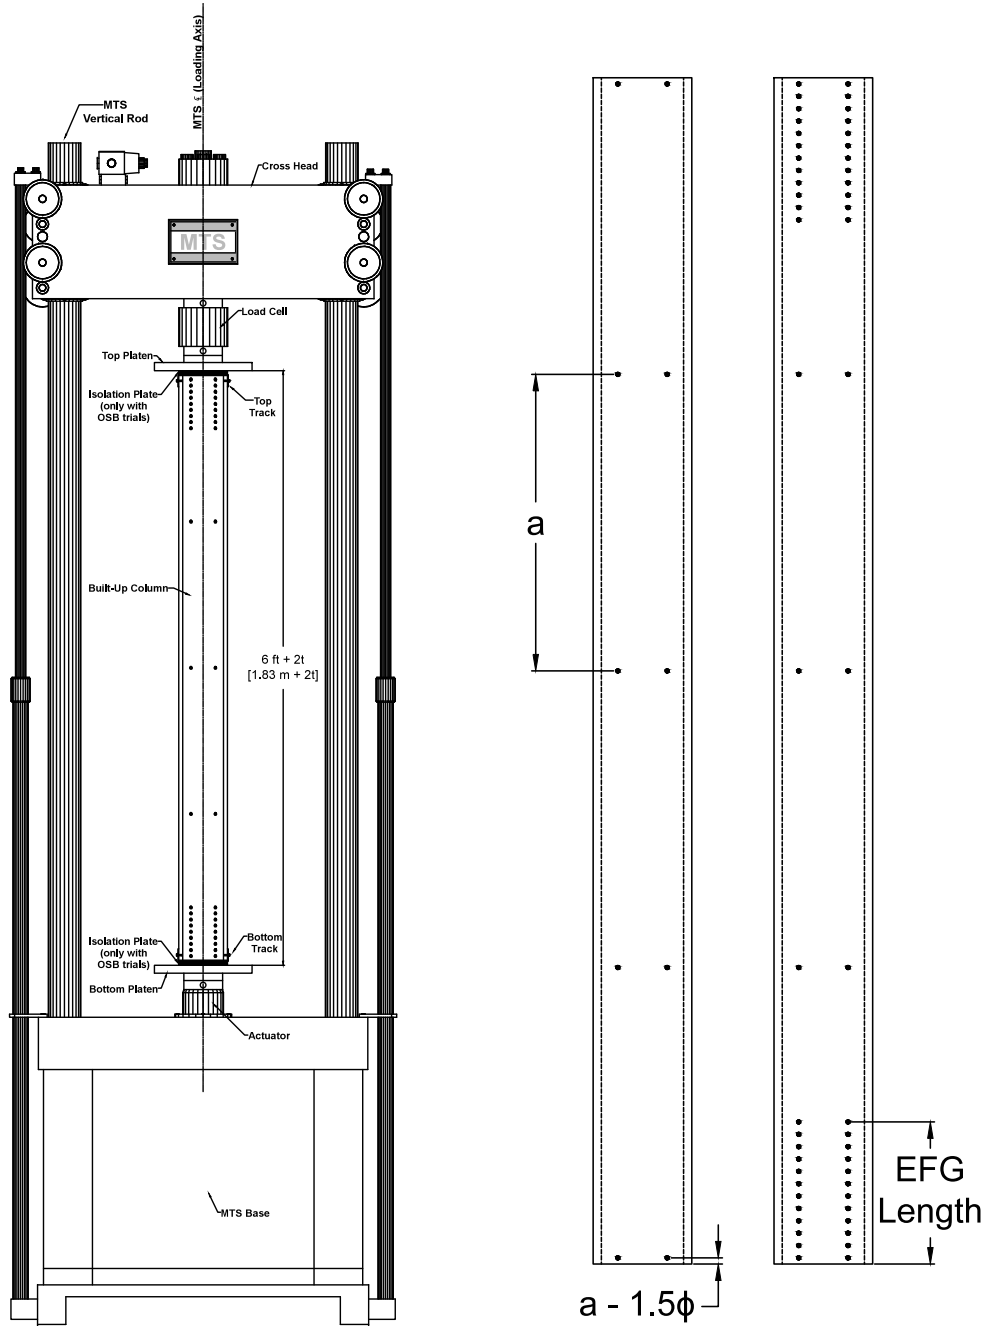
Elevation of test rig setup (left) and the two parametric fastener layouts used (right)
